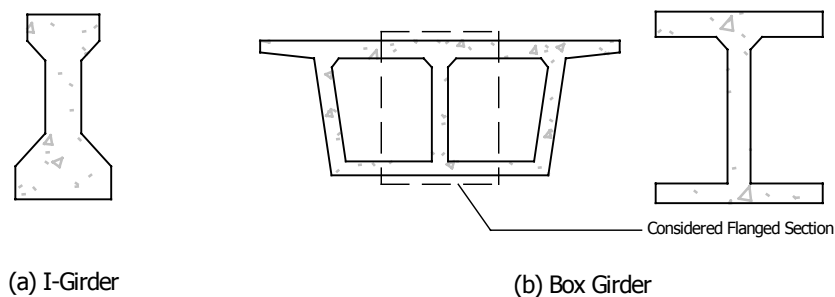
FLANGED SECTIONS IN PRESTRESSED CONCRETE STRUCTURES
